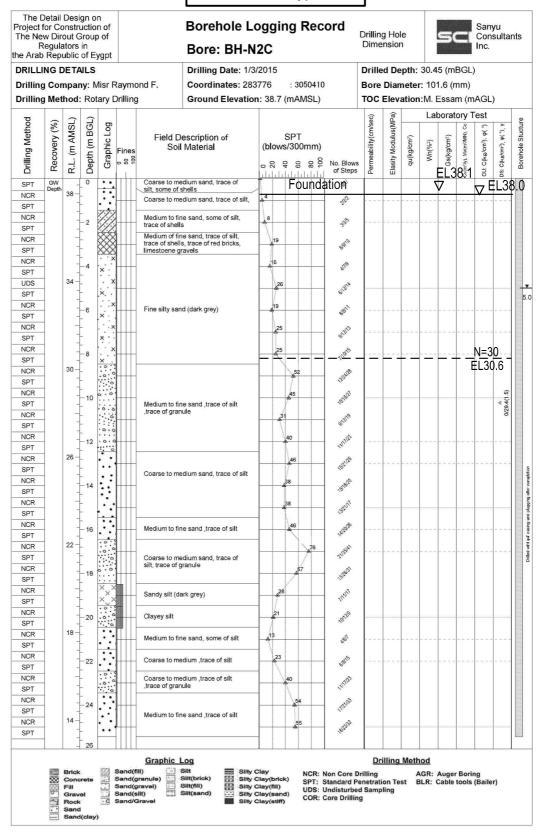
Br No. BH-N2C Bahr Yusef regulator (L type wall)
